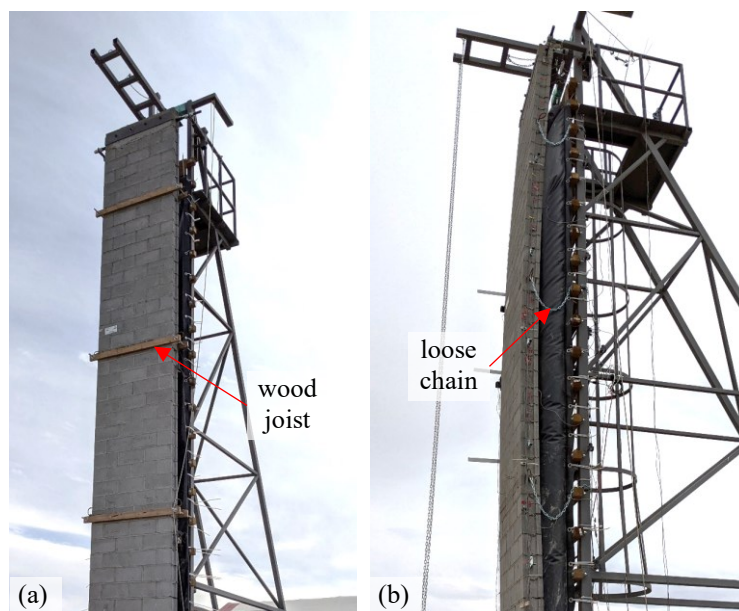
Lateral bracing of the wall specimen (a) Temporary wood joists bolted to the frame (b) Loose chains to restrain excessive displacement on the wall during test.
